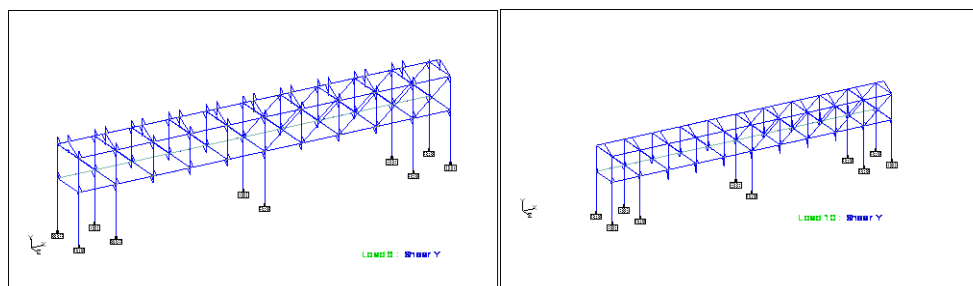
Shear force diagram of Foot Over Bridge for Dead load and Live Load
